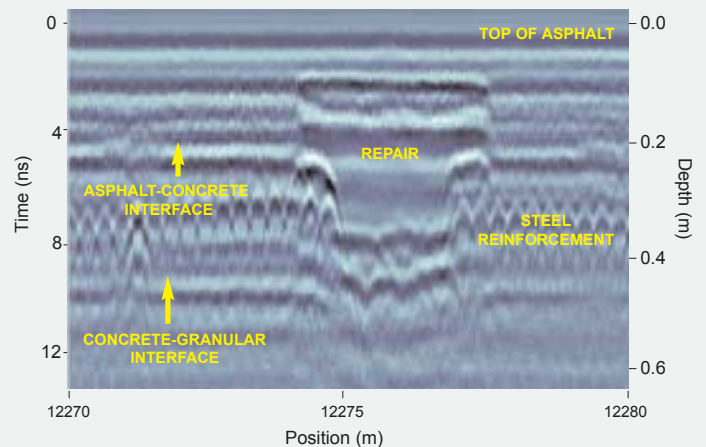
Another repair zone on Hwy. 401 - “Site 2”. In the repaired section, the steel reinforcing and possibly the concrete slab have been removed.
